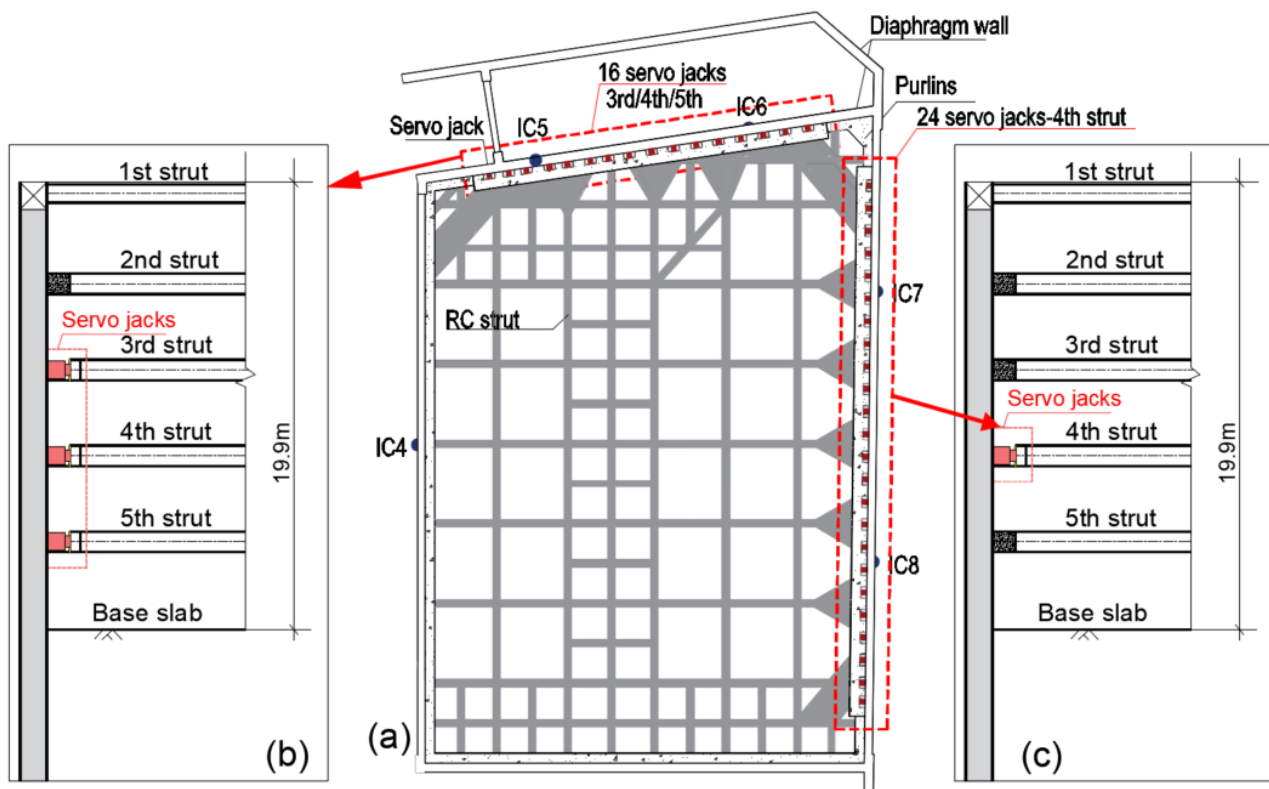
Bracing structure design of the Z3 with servo concrete struts: (a) top view; (b) cross-section of north side; (c) cross-section of east side.
